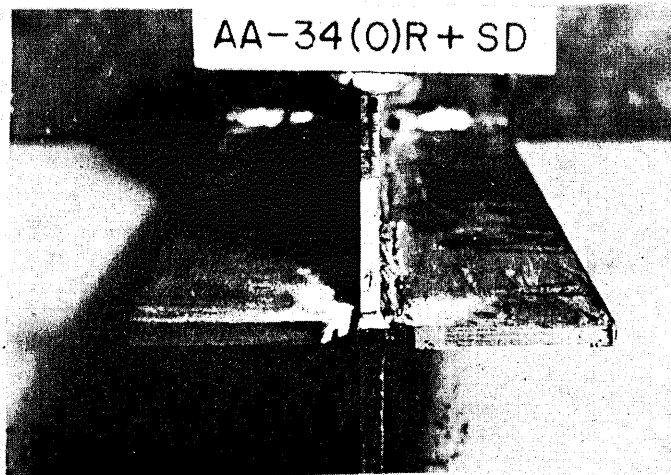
TYPICAL FATIGUE FRACTURES OF STIFFENER SPECIMENS
